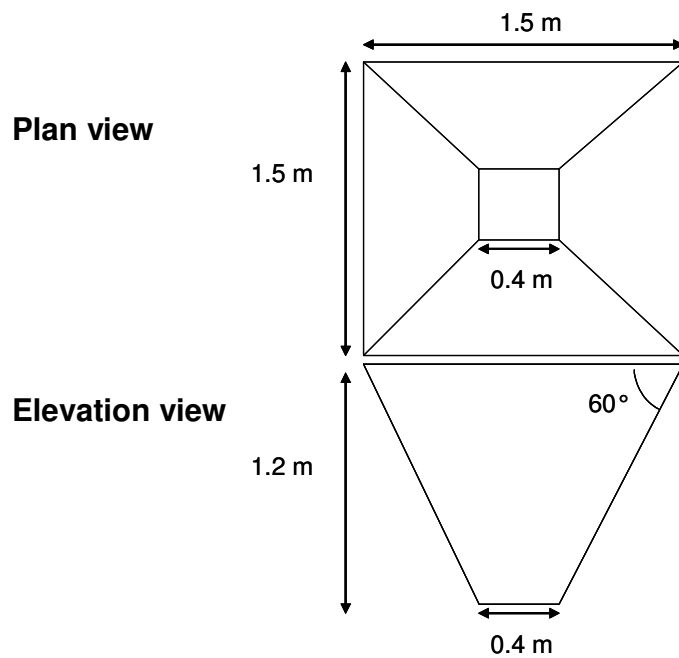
Plan and elevation views of the sediment retention system (SRS).
